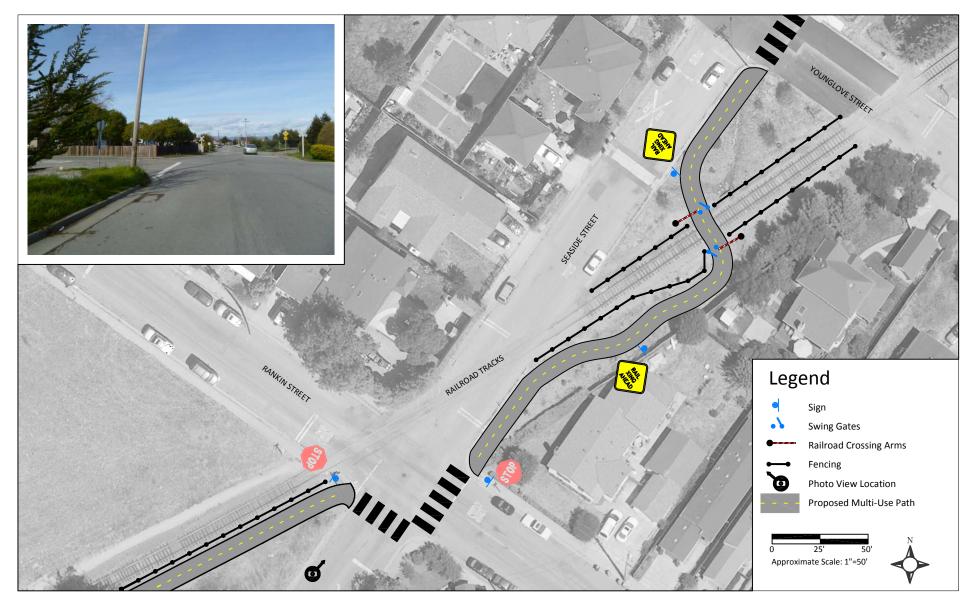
Crossing No. 30-31, Seaside Street and Rankin Street
